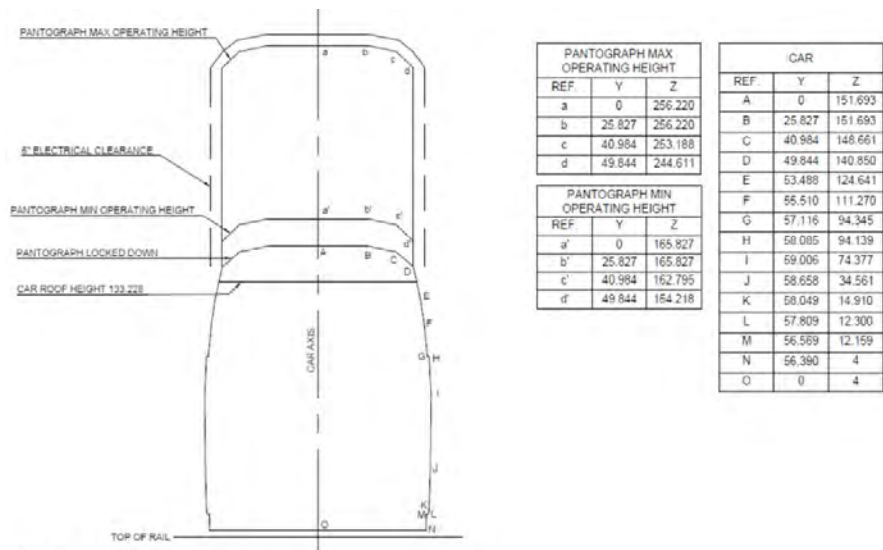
East New York Tunnel space-proofing study for NYCT B Division railroad car
